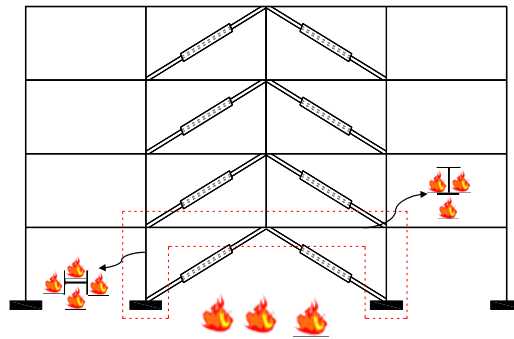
View of Damaged Structural Plane Frame, subjected to the Post-event Fire
